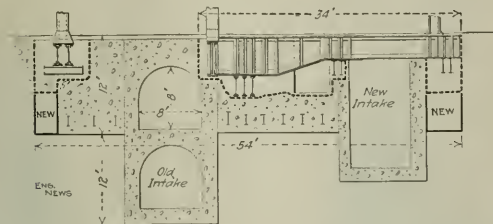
RECONSTRUCTED TURBINE FOUNDATION
